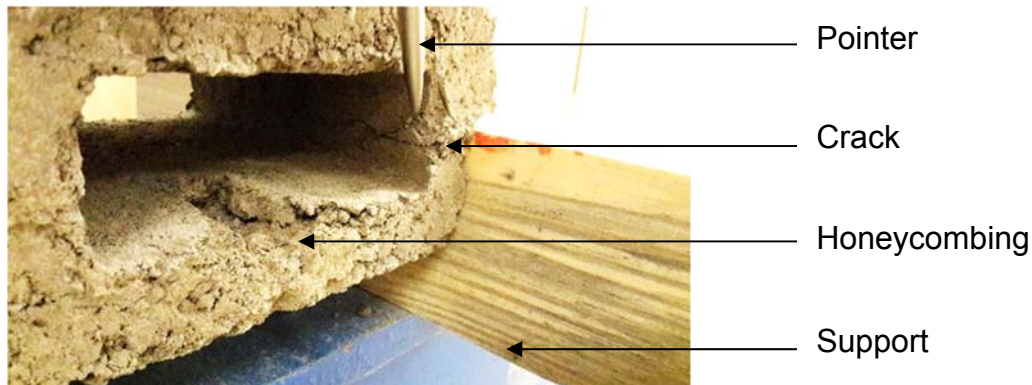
Filler block with a crack and honeycombing at the bottom shell
